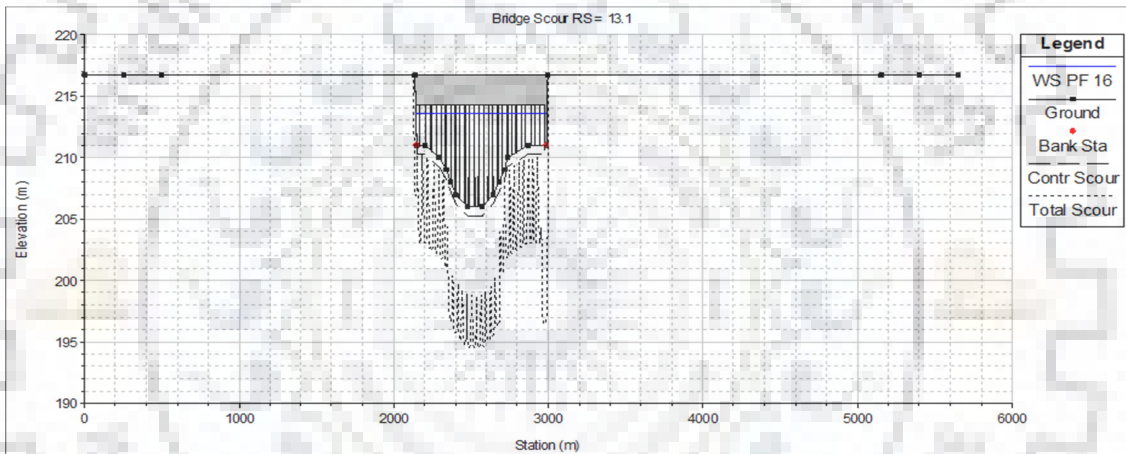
Scour around bridge abutment and piers at 14500 cumec for Bridge 3
